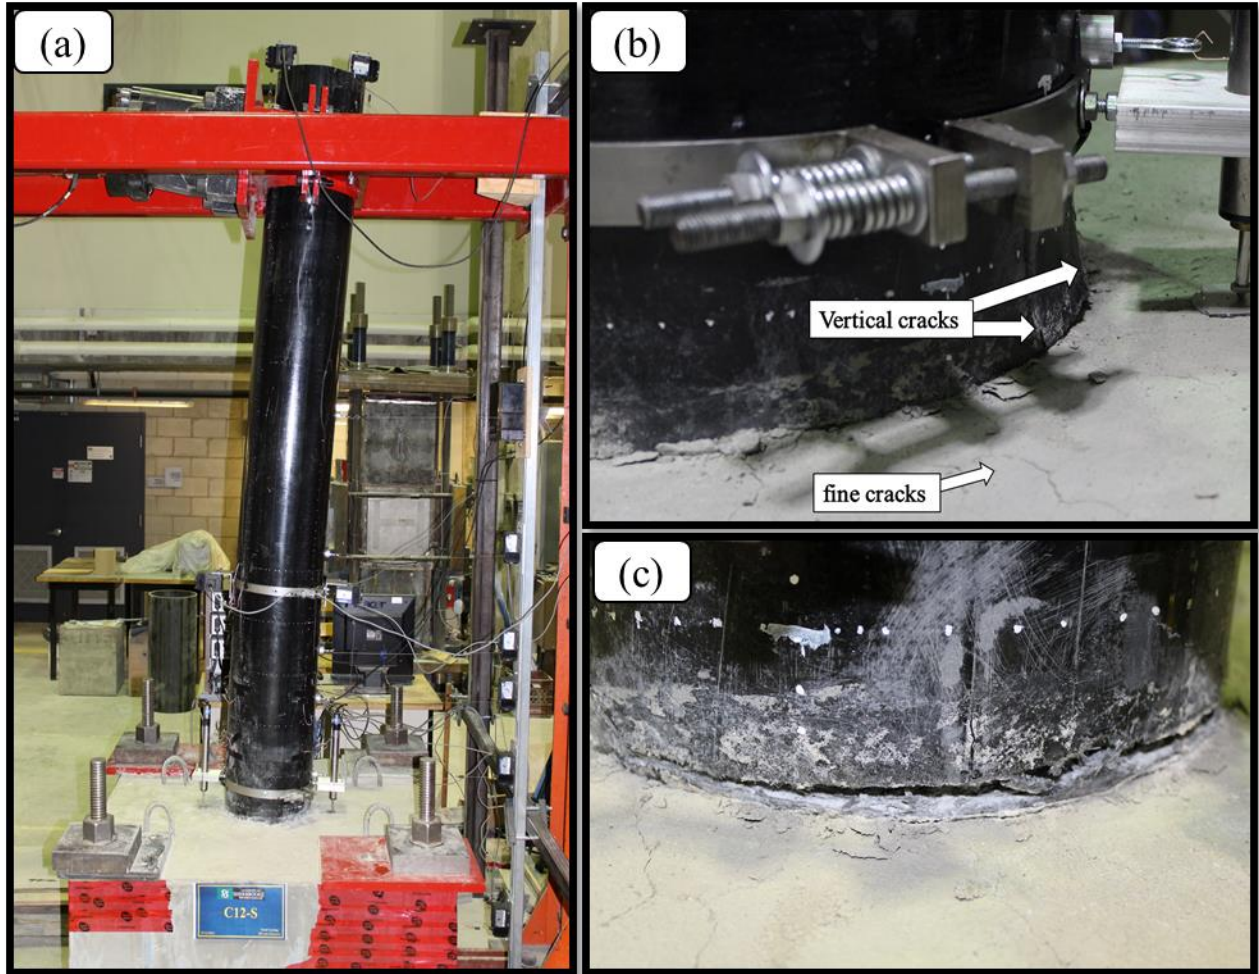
(a) Specimen at maximum deflection, (b) Specimen failure mode, (c) Tube surface rupture
